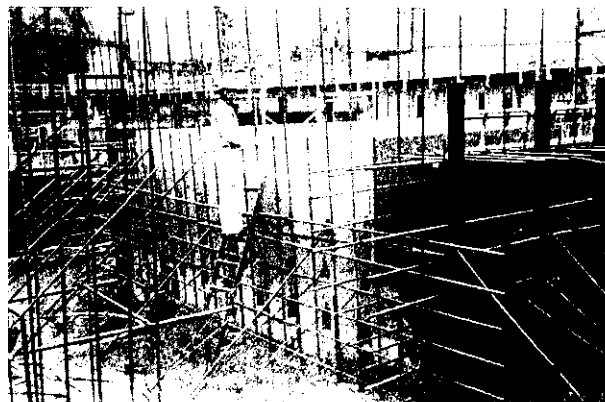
Applying SEED-Form to a gate wall in Unazuki Dam
